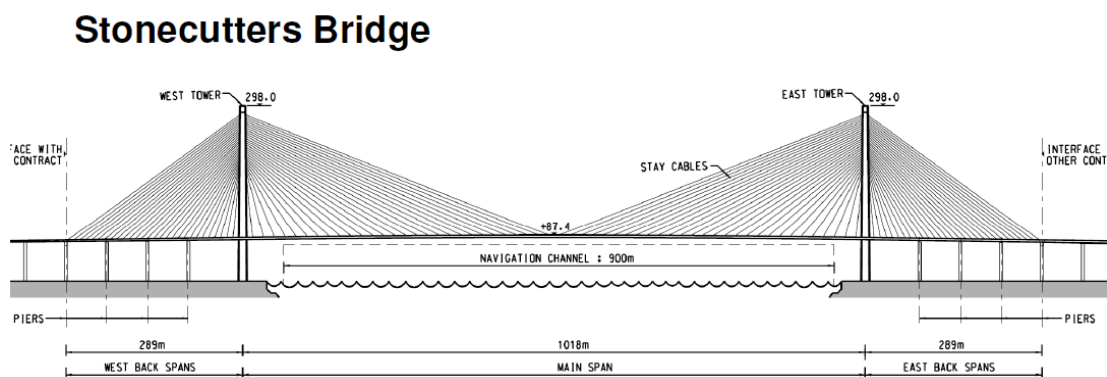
Side view of Stonecutter Bridge showing the skeleton of its structure
